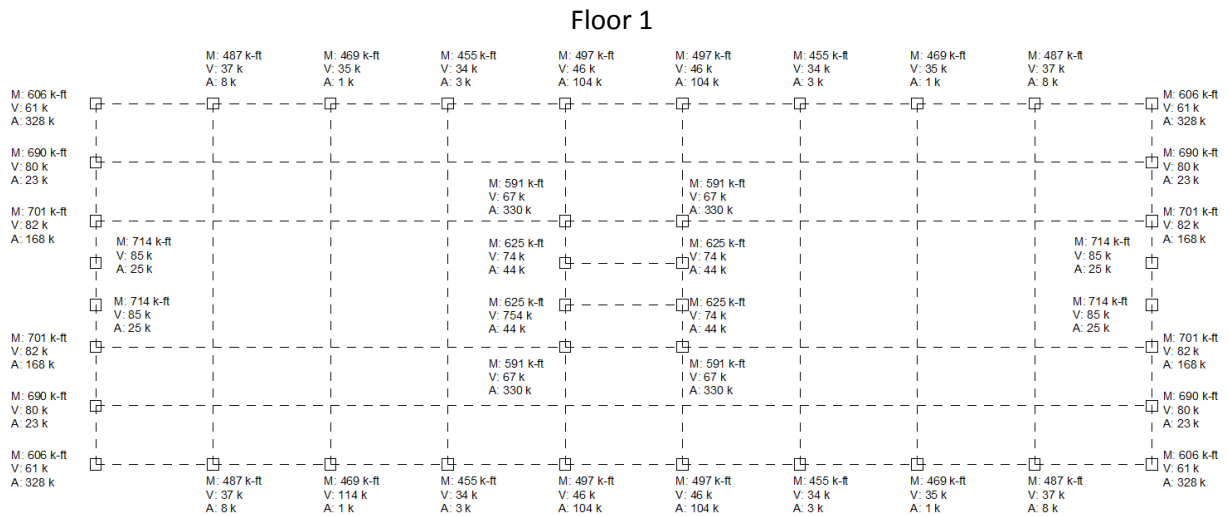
Maximum forces in the first floor columns due to tsunami base shear
